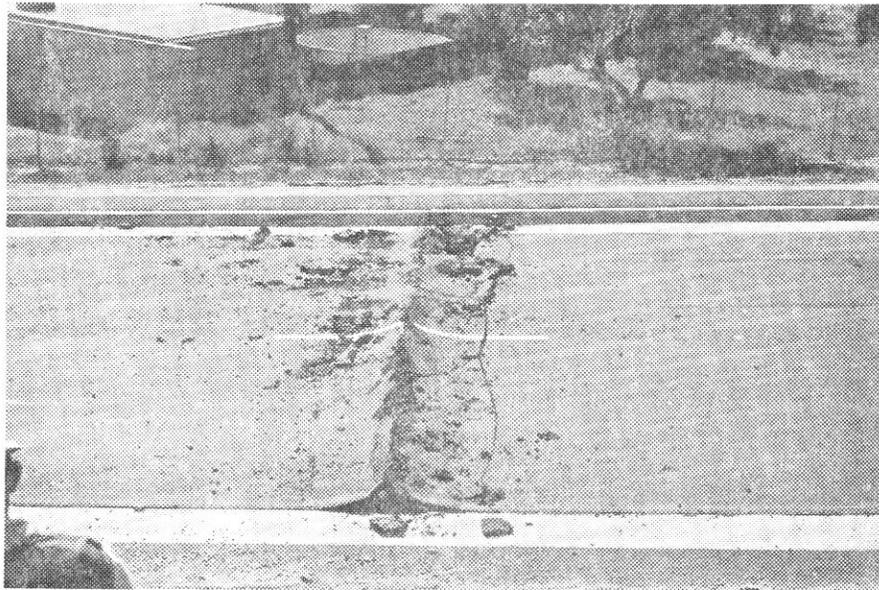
Compression buckle in AC pavement of eastbound off ramp to Roxford Street.
